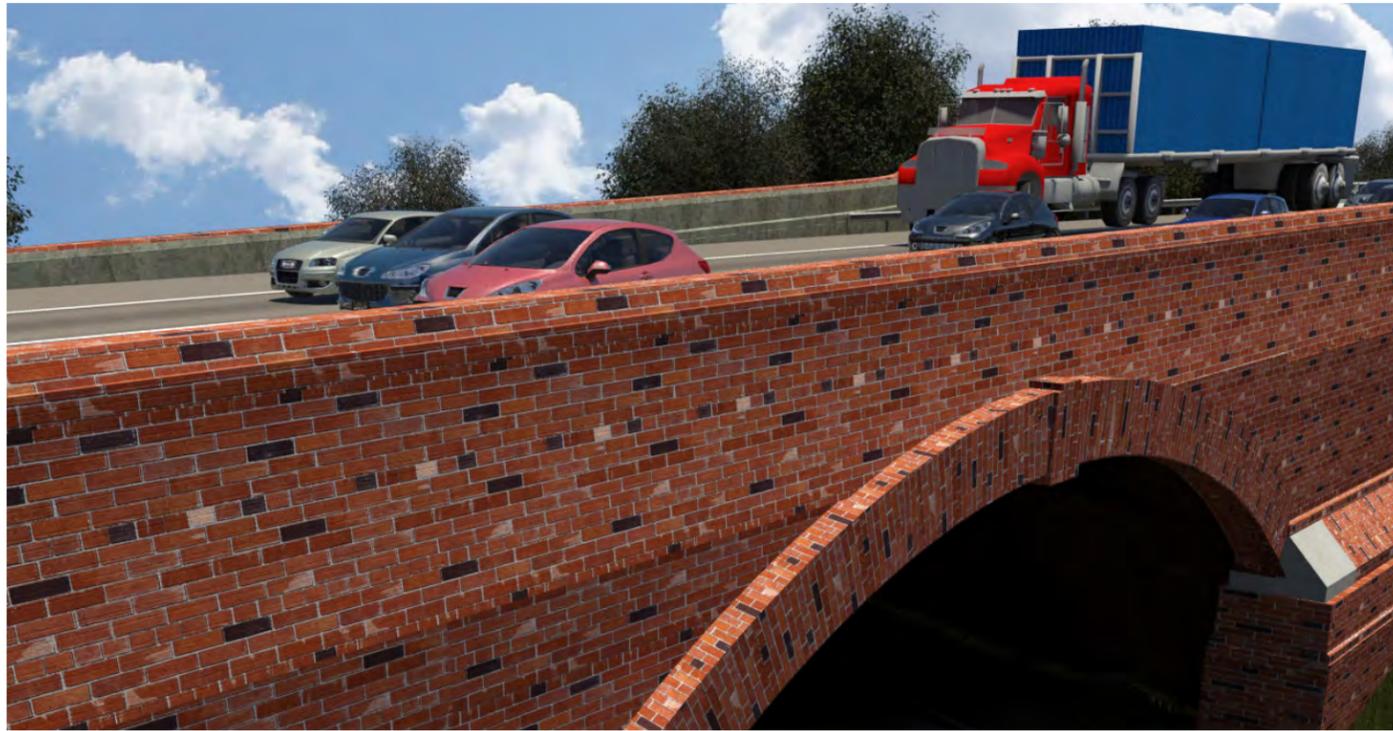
Colonial Parkway Aesthetics. Our design uses solid brick to blend the new portions of the widened arches with the existing arches.
